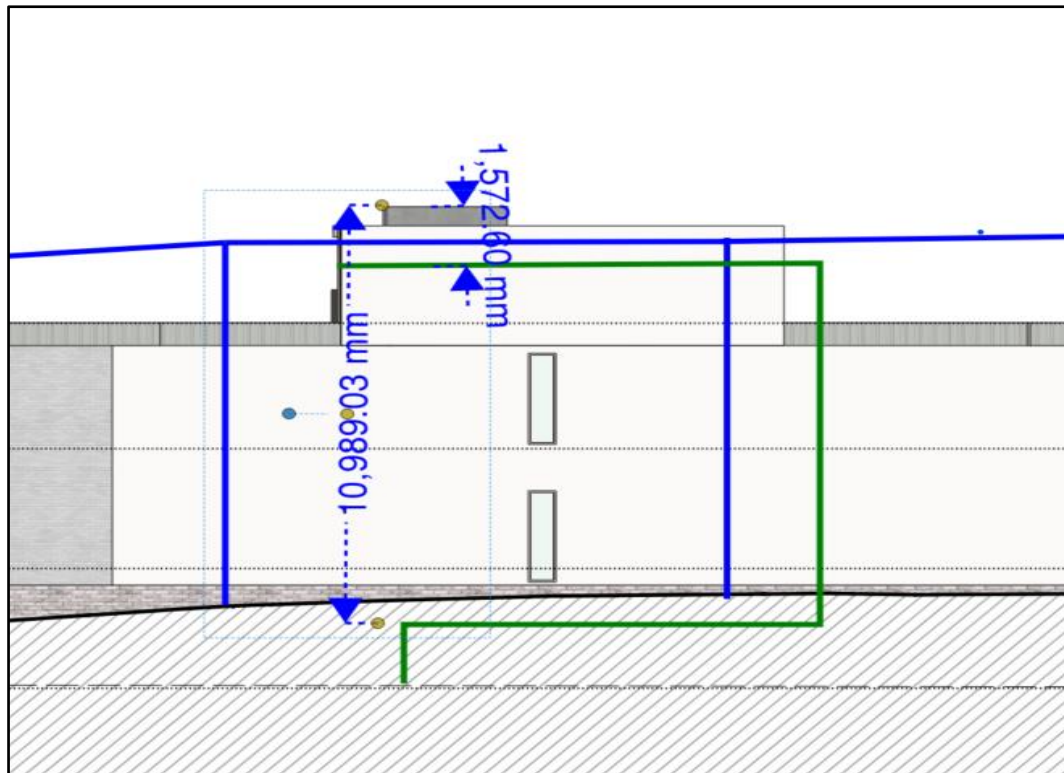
Graphic indicating the building envelope measurable from 42m AHD (Green), being relevant for lift overrun and roof terrace.
